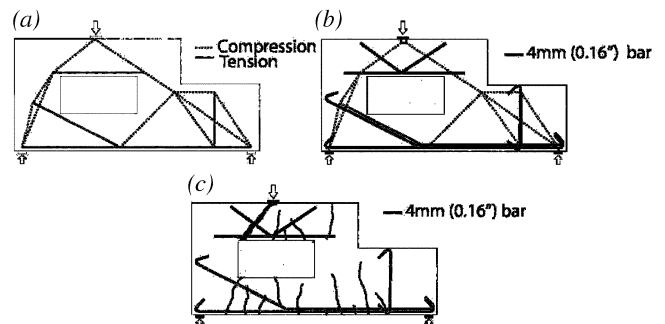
Specimen 1: (a) STM; (b) reinforcing layout superimposed on STM; and (c) crack pattern at failure superimposed on reinforcing layout.
